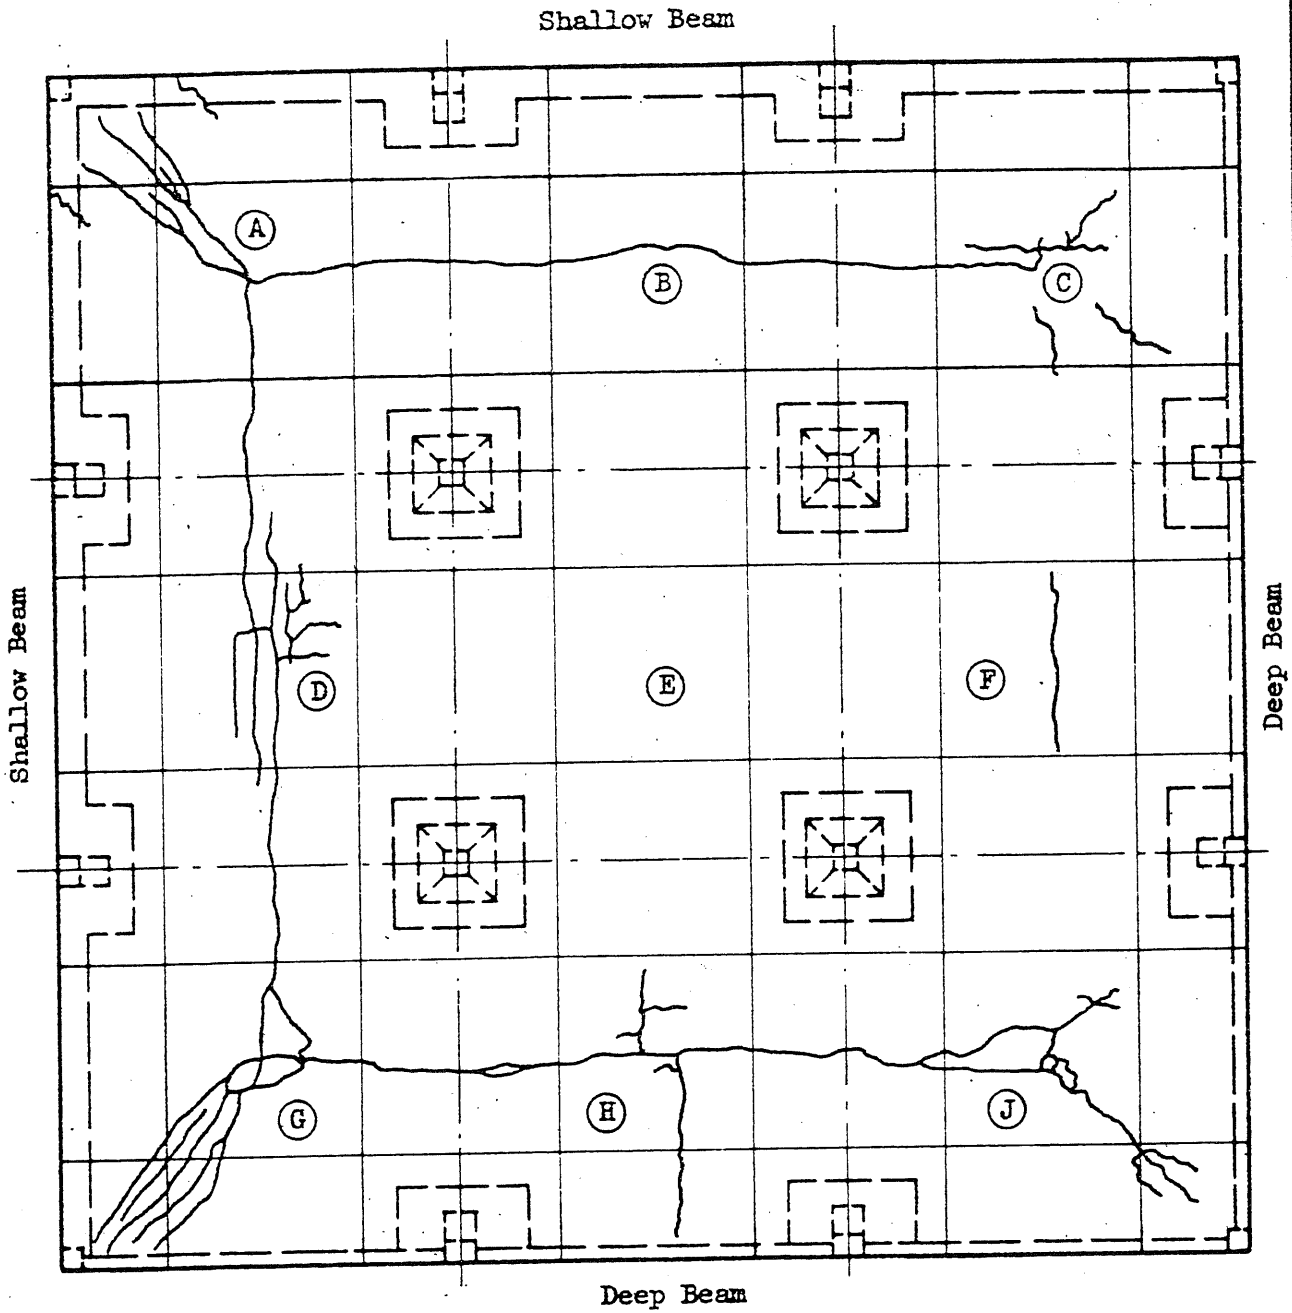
CRACK PATTERN ON BOTTOM OF SLAB F⁴ AFTER TEST TO FAILURE
